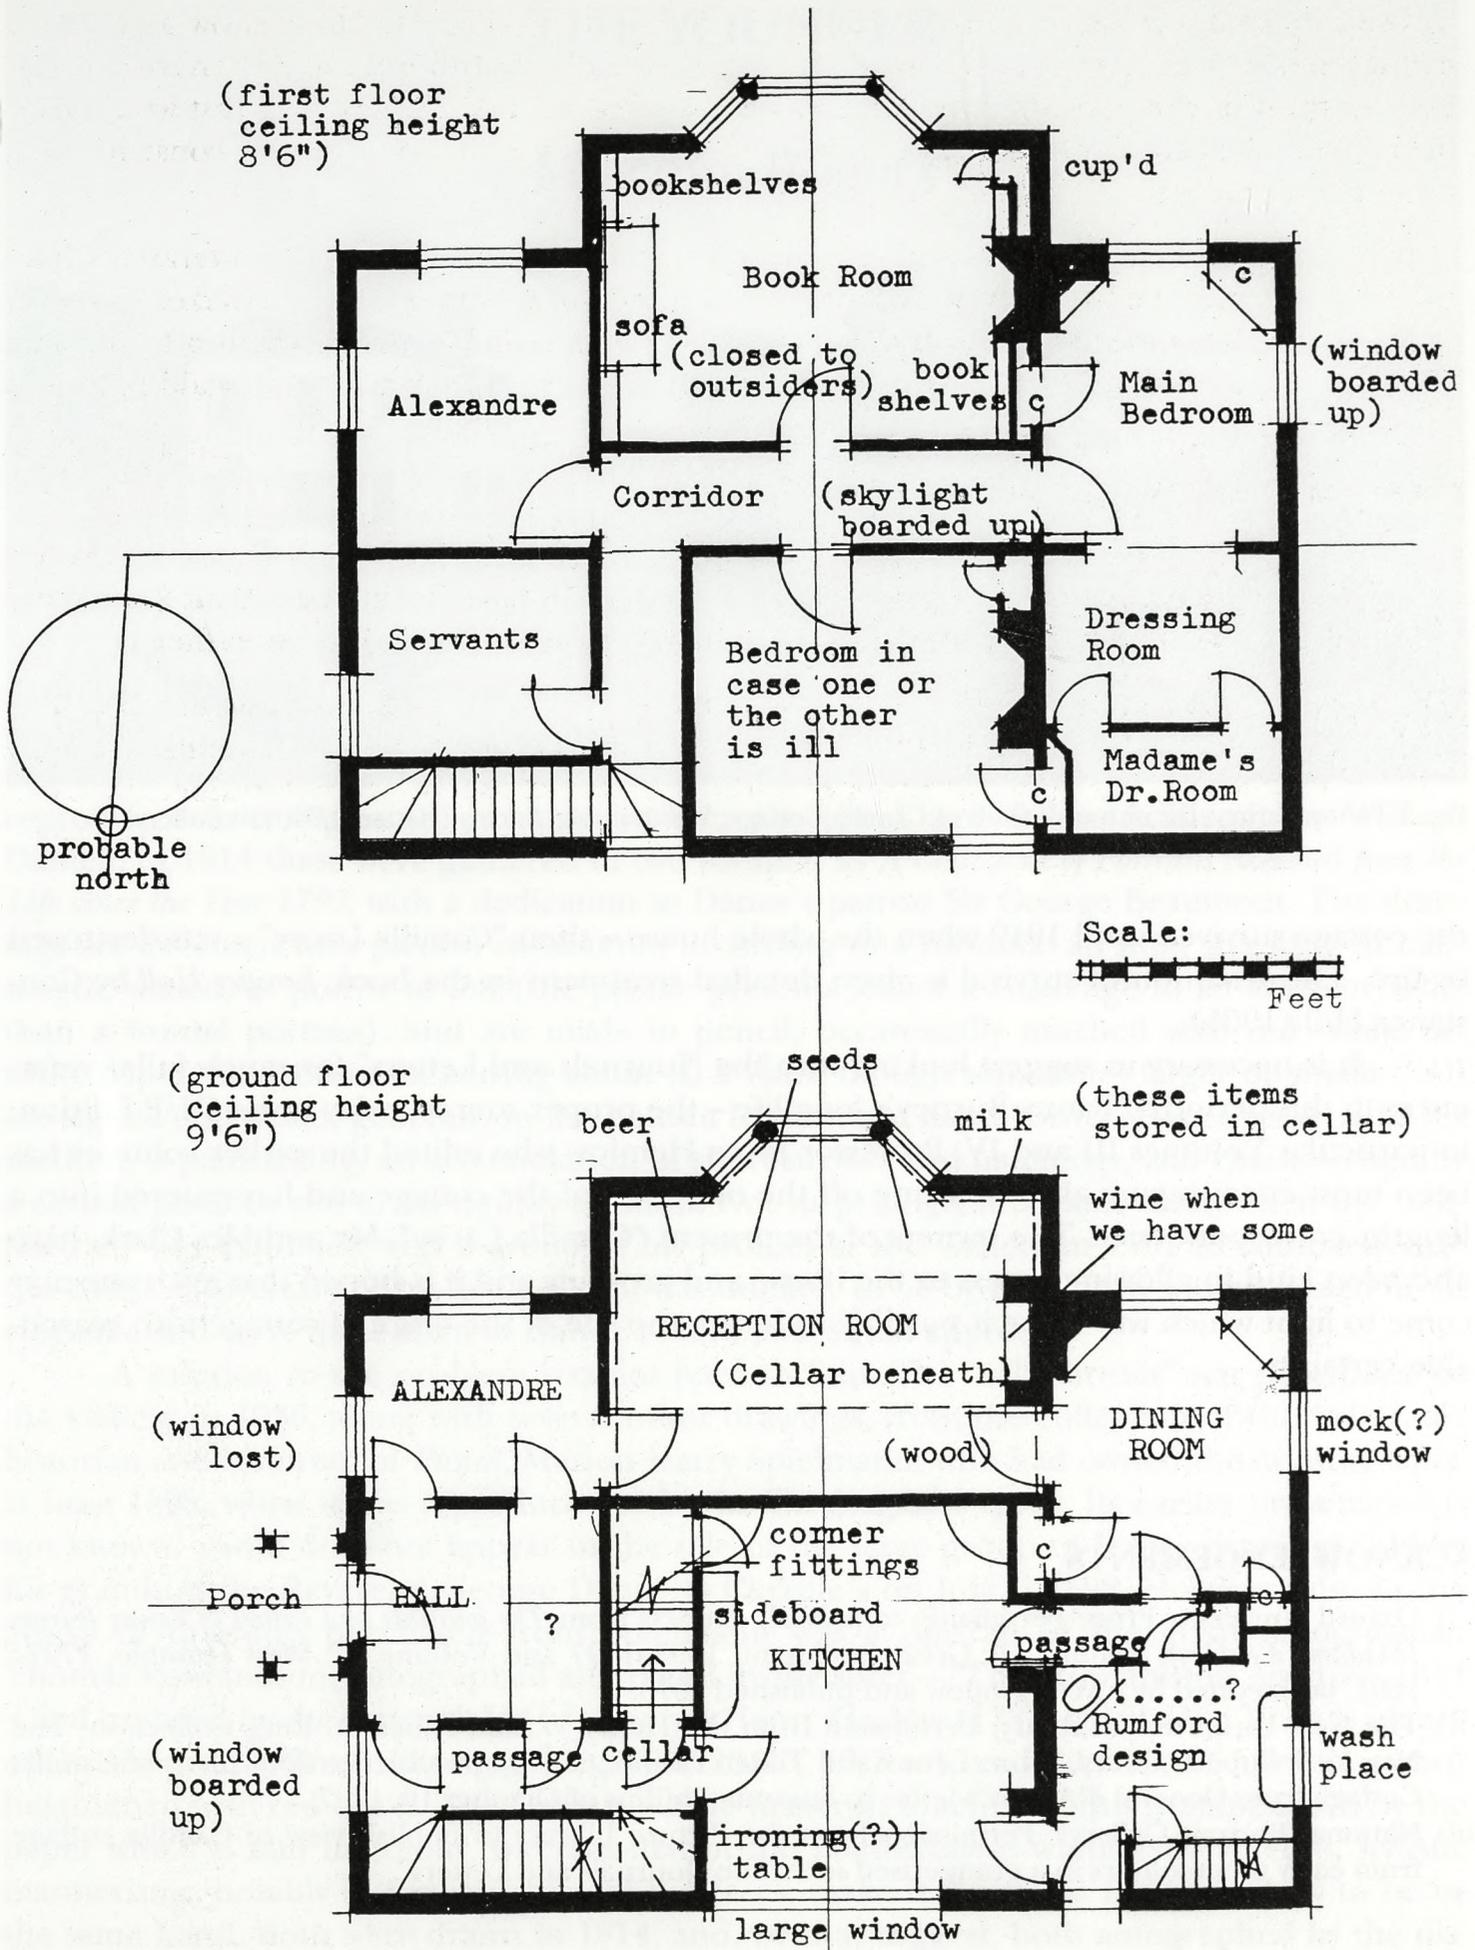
Ground and first floor plans of Camilla cottage re-drawn from Gen. d'Arbly's sketch plan and with his notes freely translated.
